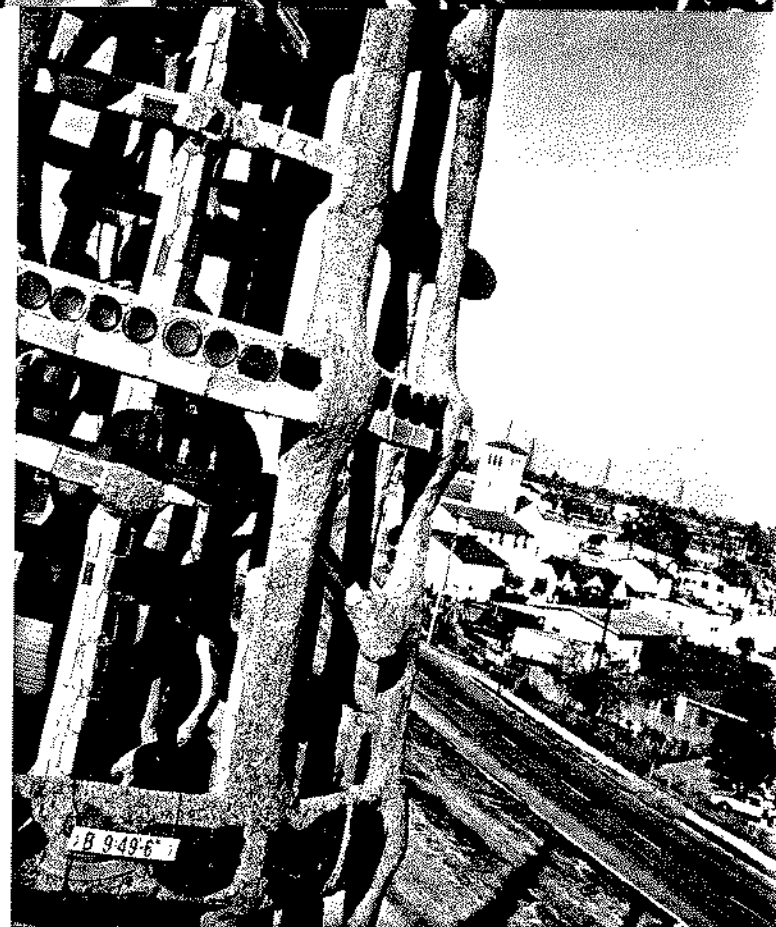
Crack in Center Tower vertical column before repair from boom bucket. December 16, 1992
